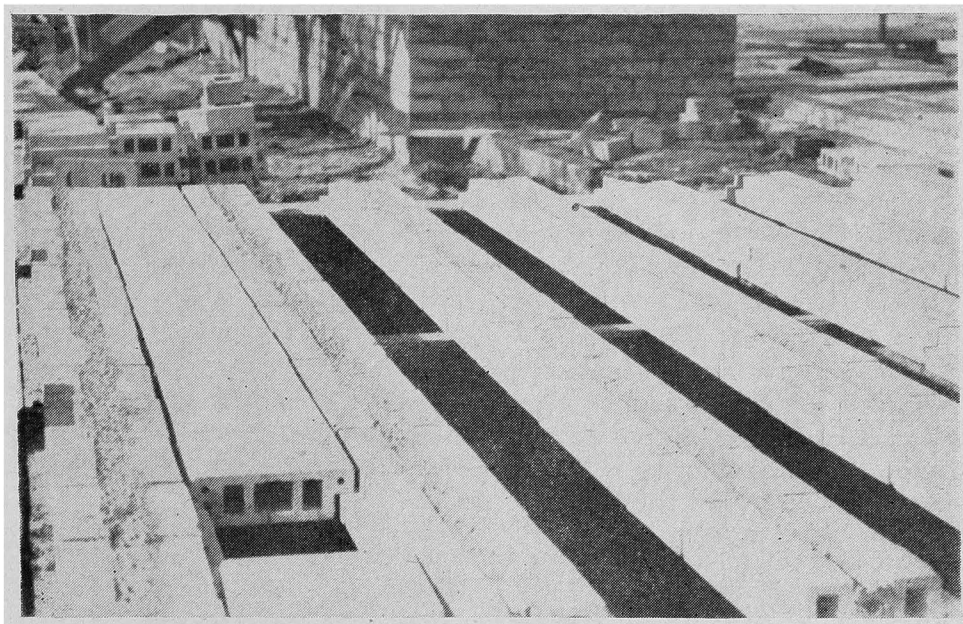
Top of slab showing the method of placing the filler tile before pouring the concrete topping.
